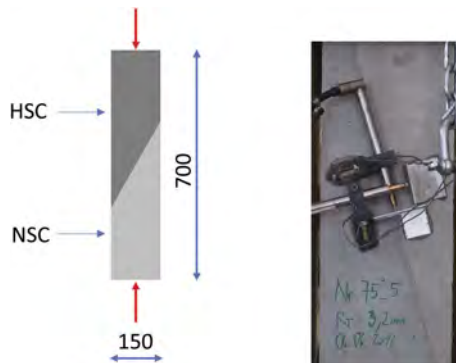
Dimensions and front view of Slant Shear Test (units: mm).
